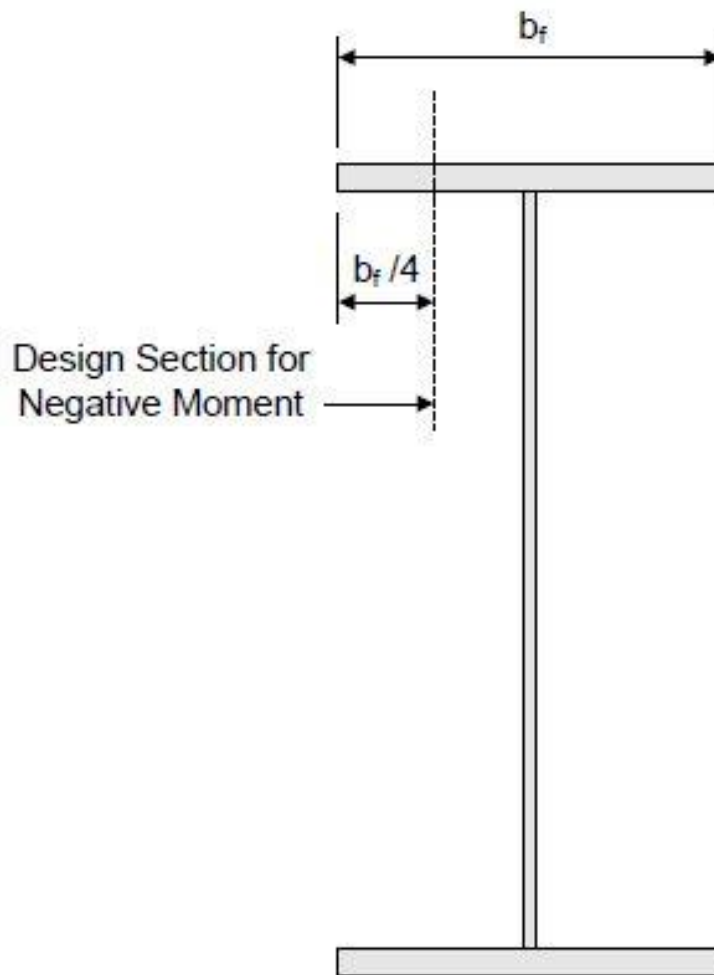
$\frac{1}{4}$  Width of Flange Design Section for Steel Girders [40]
